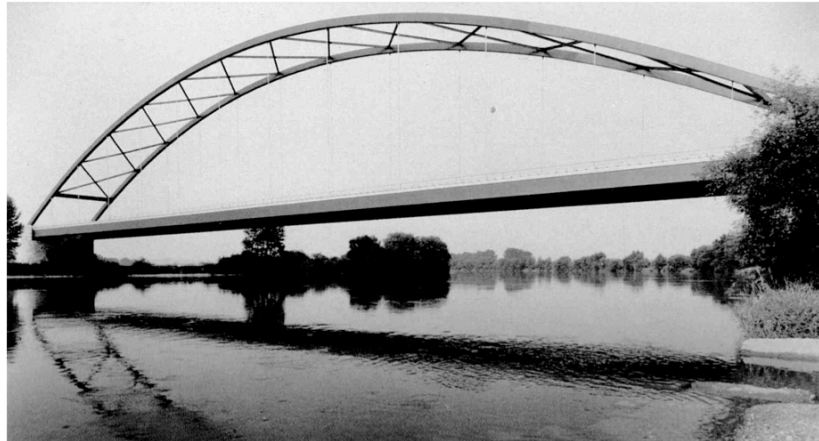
Straubing Bridge – Bavaria [13]
